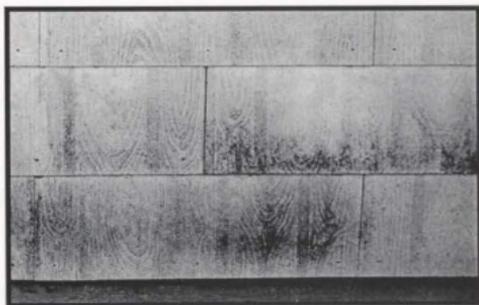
Mold and mildew growth on the shingles of the northern elevation.
